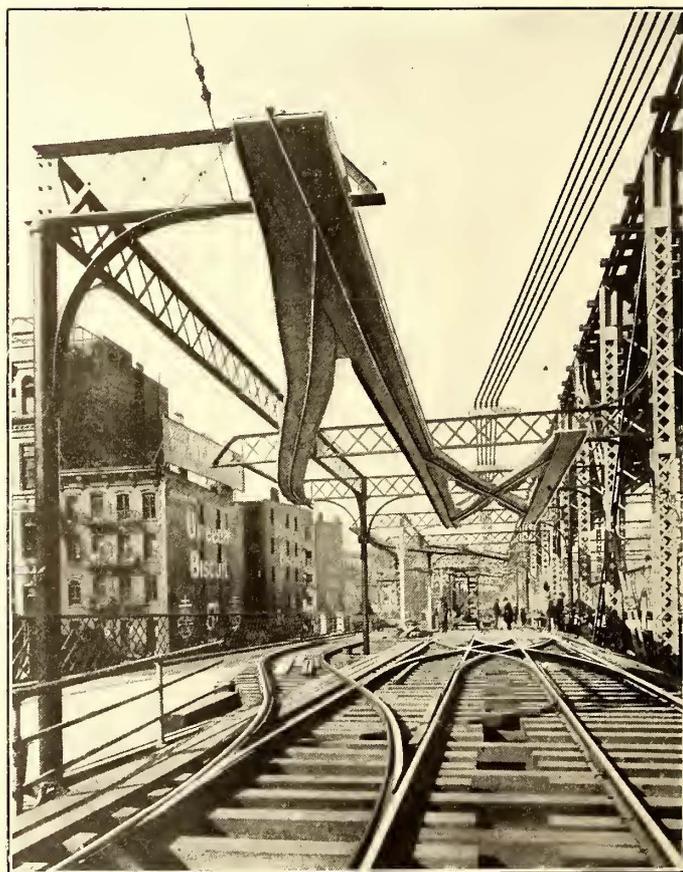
OVERHEAD CONSTRUCTION AT MANHATTAN TERMINAL, SHOWING OVERHEAD CONTACT BARS AND SHEET-STEEL TROUGHS.
